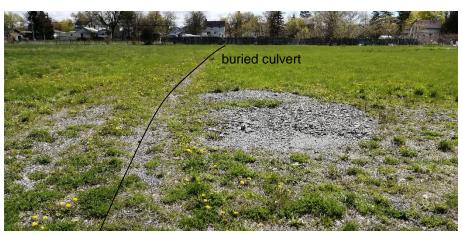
view of the culvert that runs across the east parcel of the subject site, facing east
